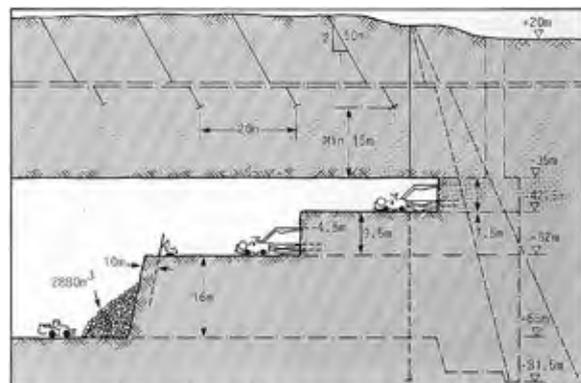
Typical excavation sequence; top heading and lower benches and with artificial groundwater infiltration from surface.
